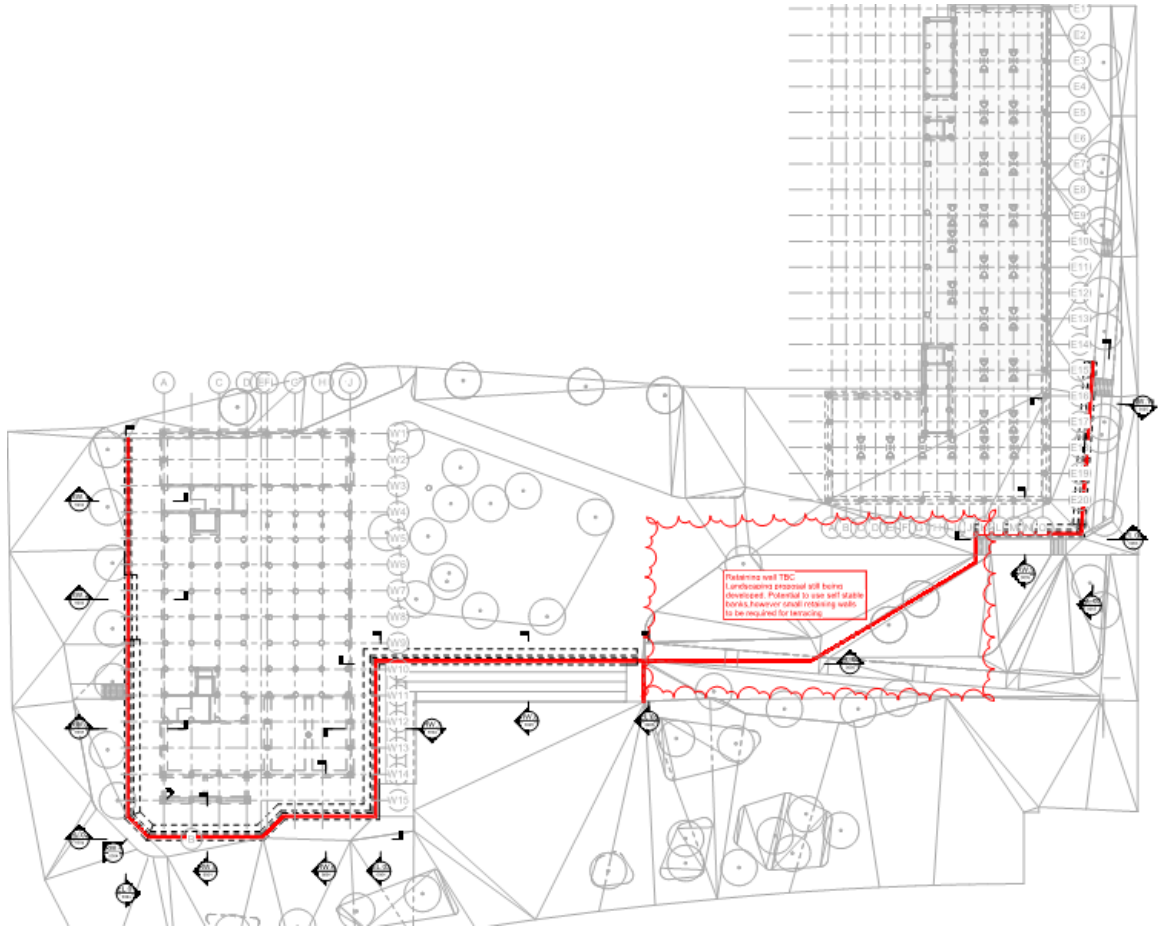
Indicative plan view of alignment of retaining wall systems around the site boundary
